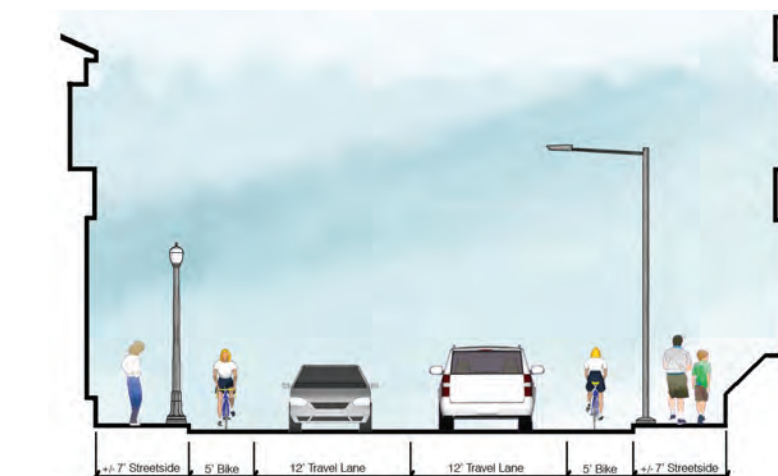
Jones Proposed Cross Section – Avenue B to Camden
